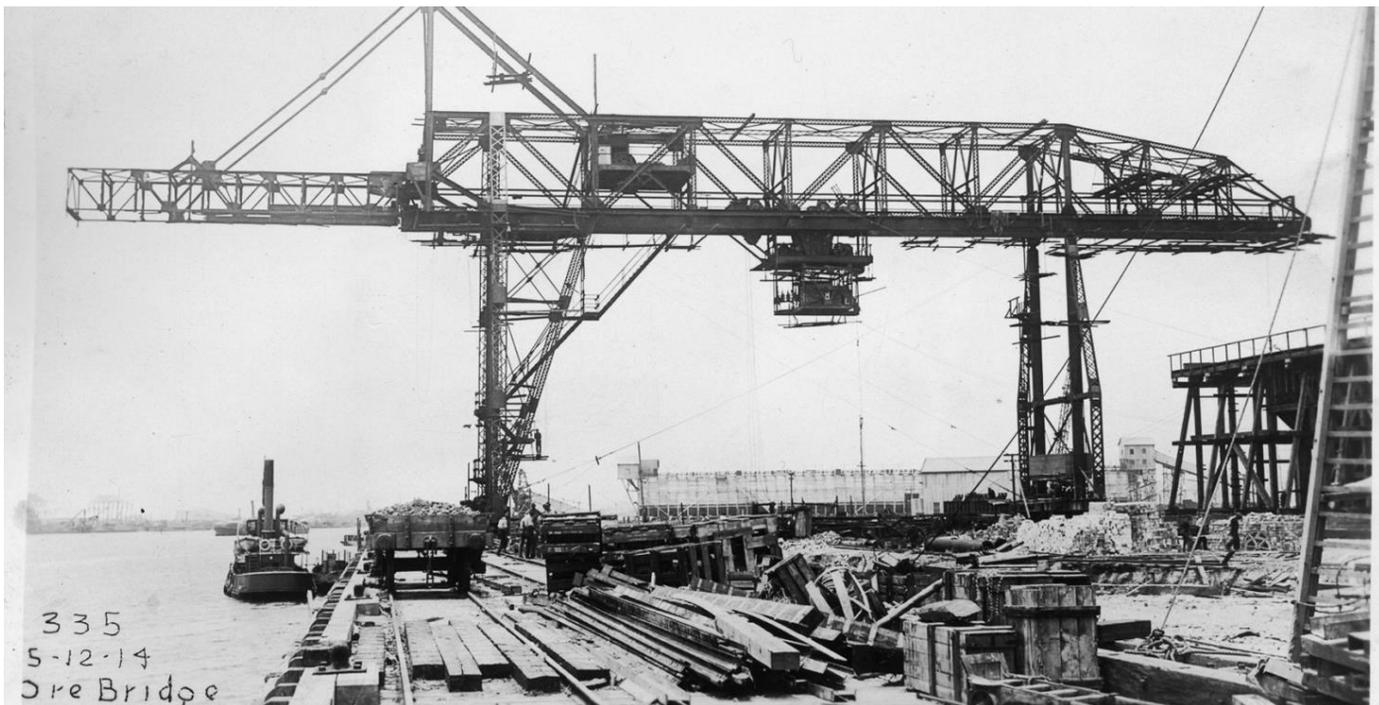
The Steelworks under construction in 1914, showing an Ore Bridge
